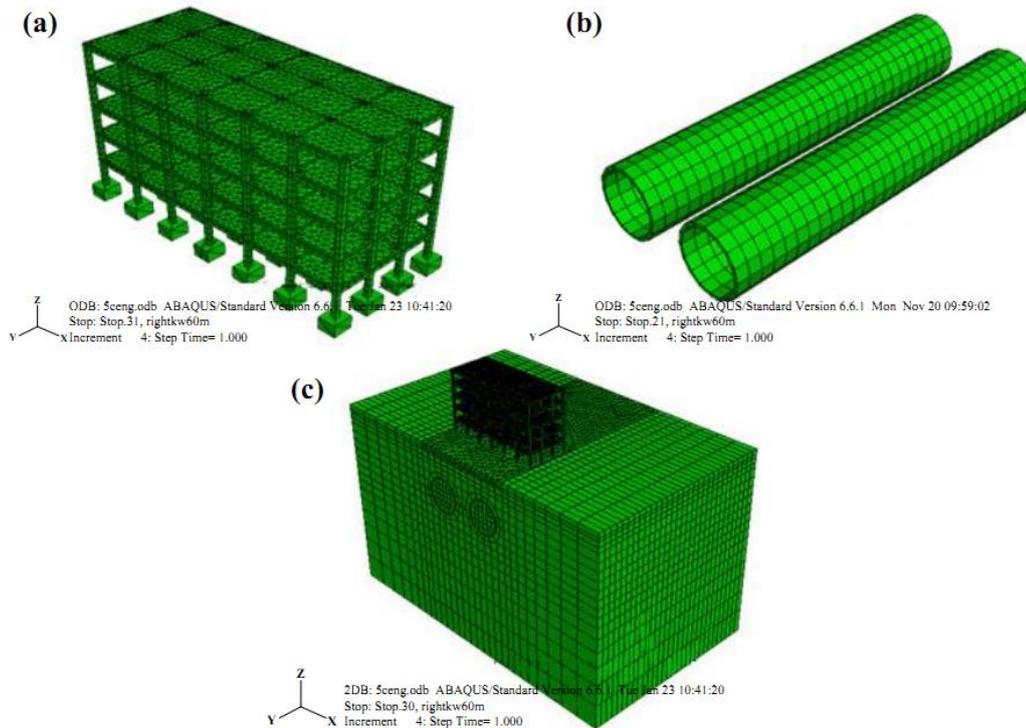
Finite element models of the building, tunnel and soils: (a) building; (b) twin-tunnel; (c) full model.
